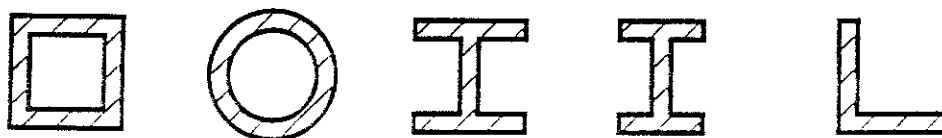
COLUMN SECTION CONFIGURATIONS
